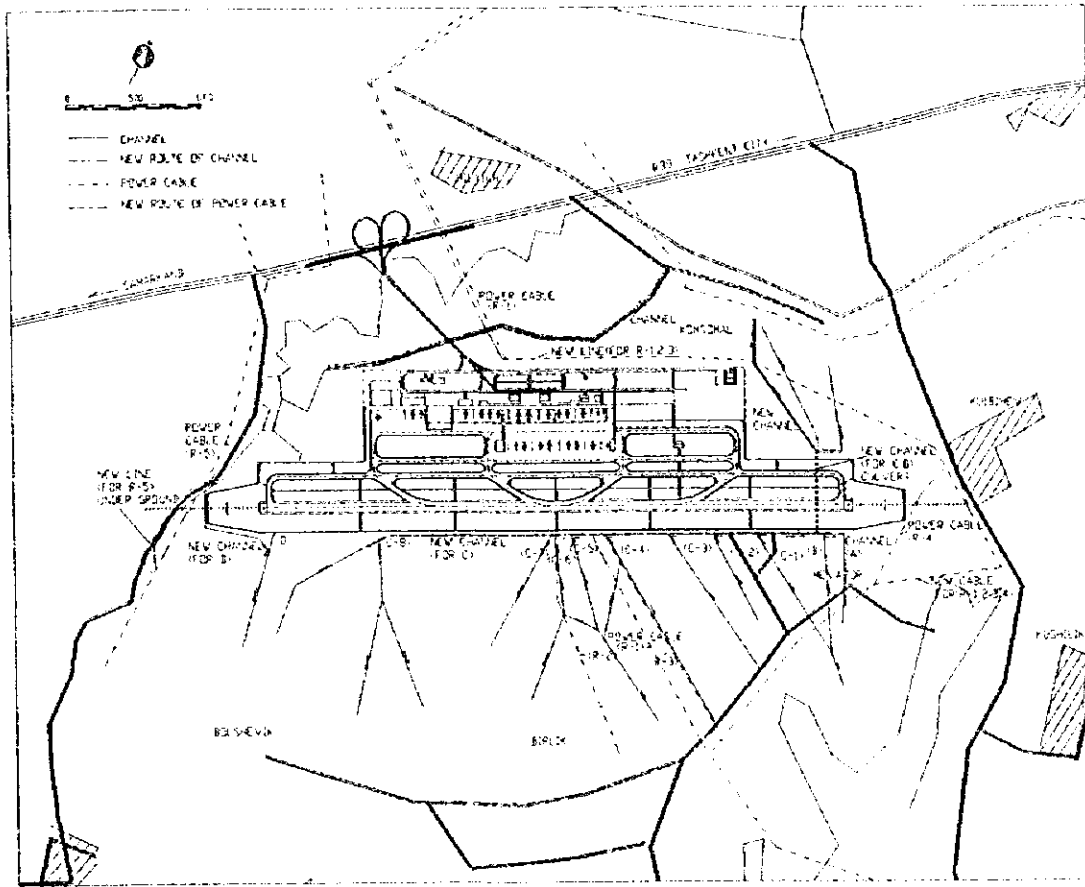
Diversion Plan of Water Channels and Power Cable Lines
